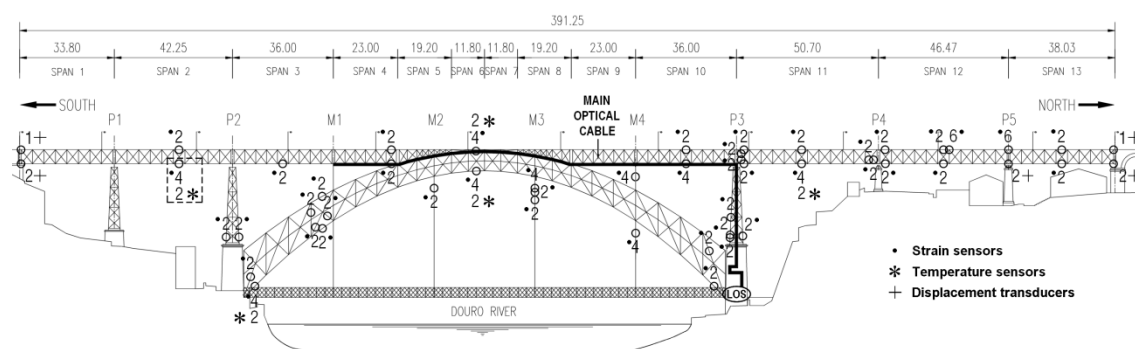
Layout of the instrumentation installed in the bridge.
